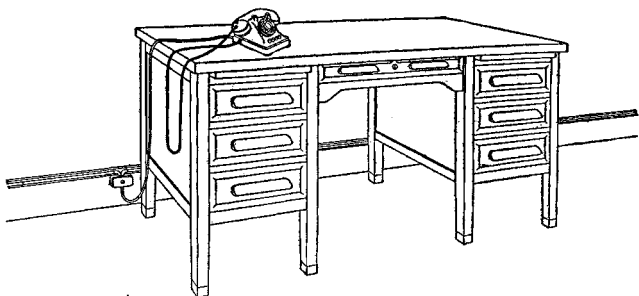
Typical Installation with Telephone Set on Wall Side of Desk
